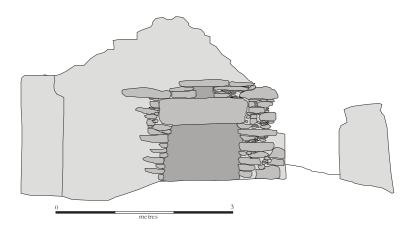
Structure 1, internal elevation of north gable of original build with fireplace
